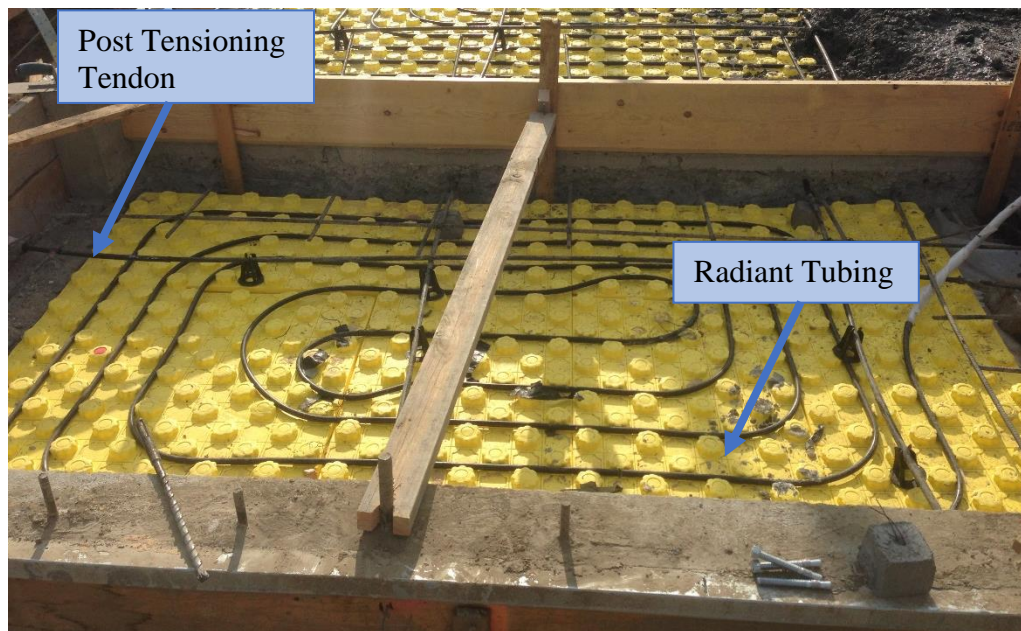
Concrete being poured over radiant tubing to create the radiant slab.
